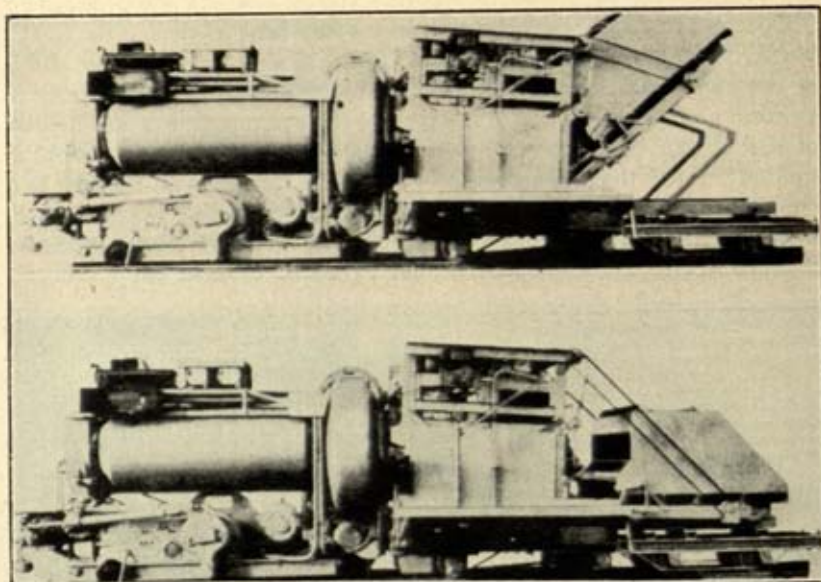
Pumperete tunnel liner, consisting of a concrete mixer, agitator hopper, and pump. (*Chain Belt Co.*)
